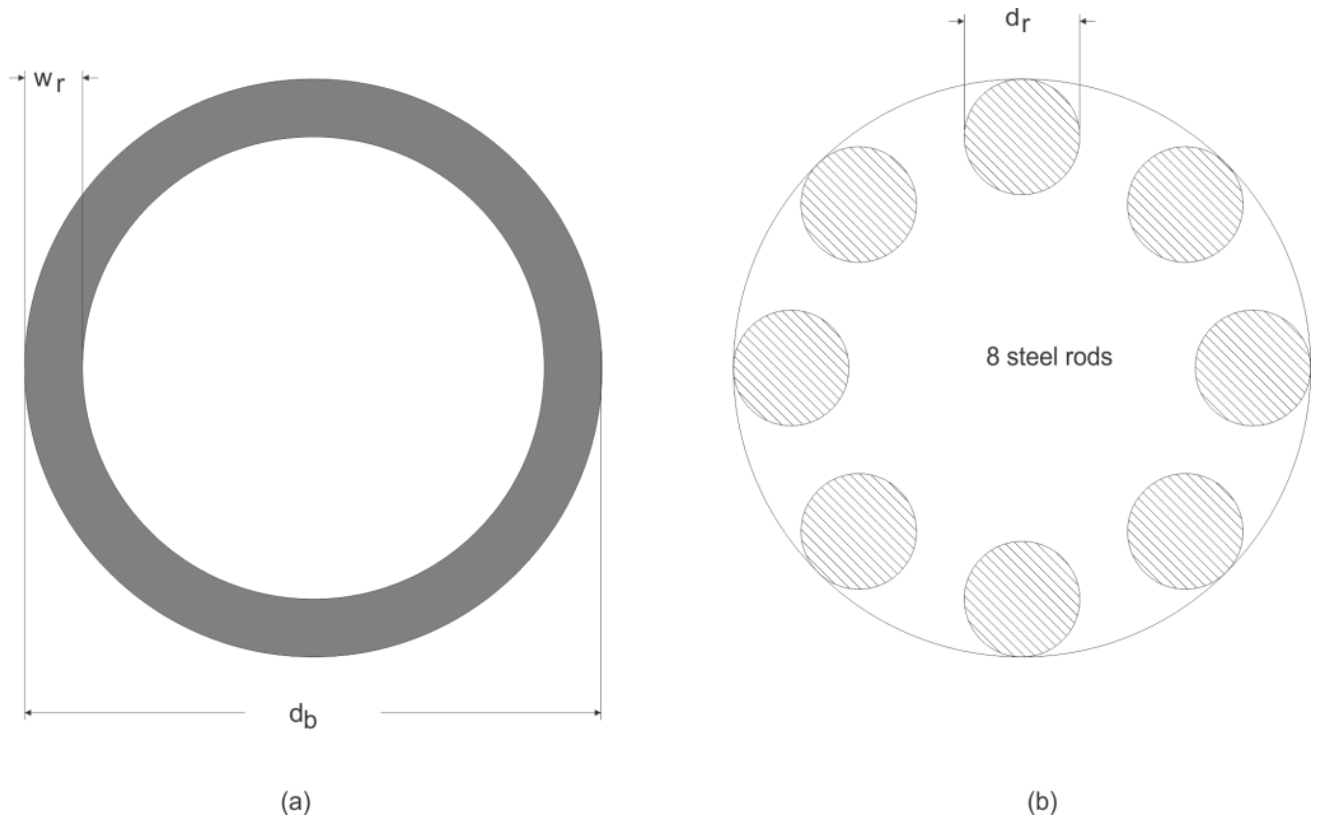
Steel Ring (a) and Steel Rods (b) Top View
